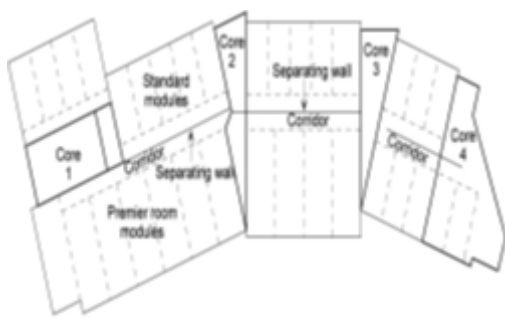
Plan of modular building at Bond Street, Bristol, showing the irregular-shaped core positions.
